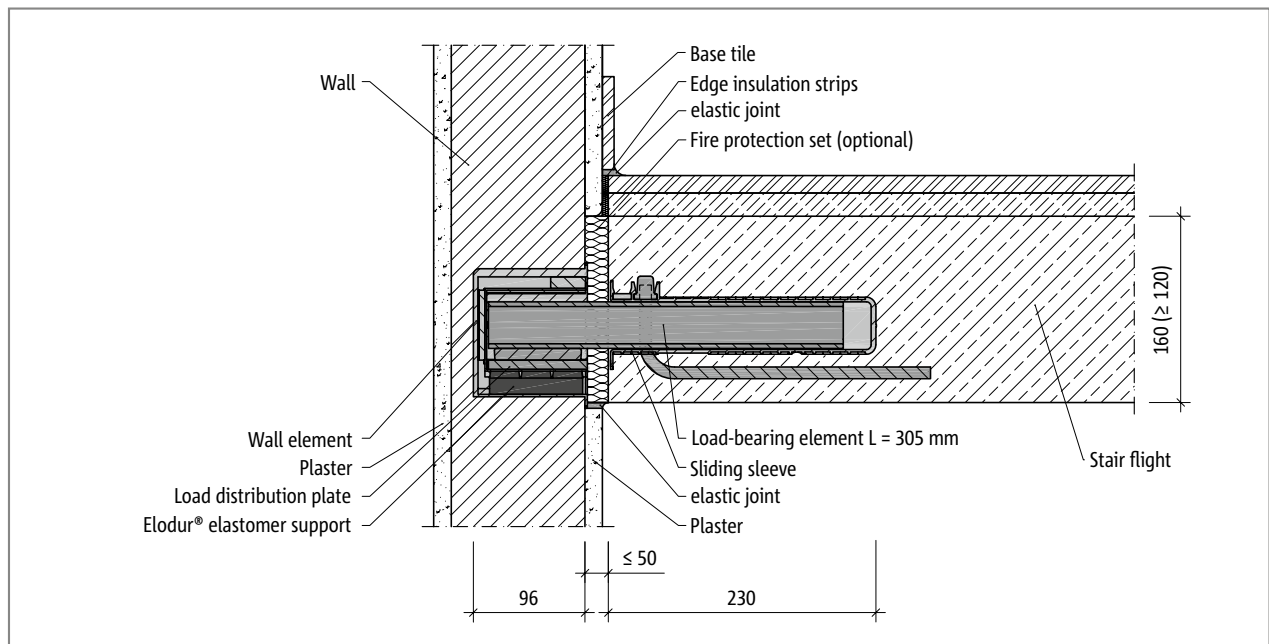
Schöck Tronsole® type Q-FV or Q-A2: Installation cross-section wall thickness 11.5 cm
